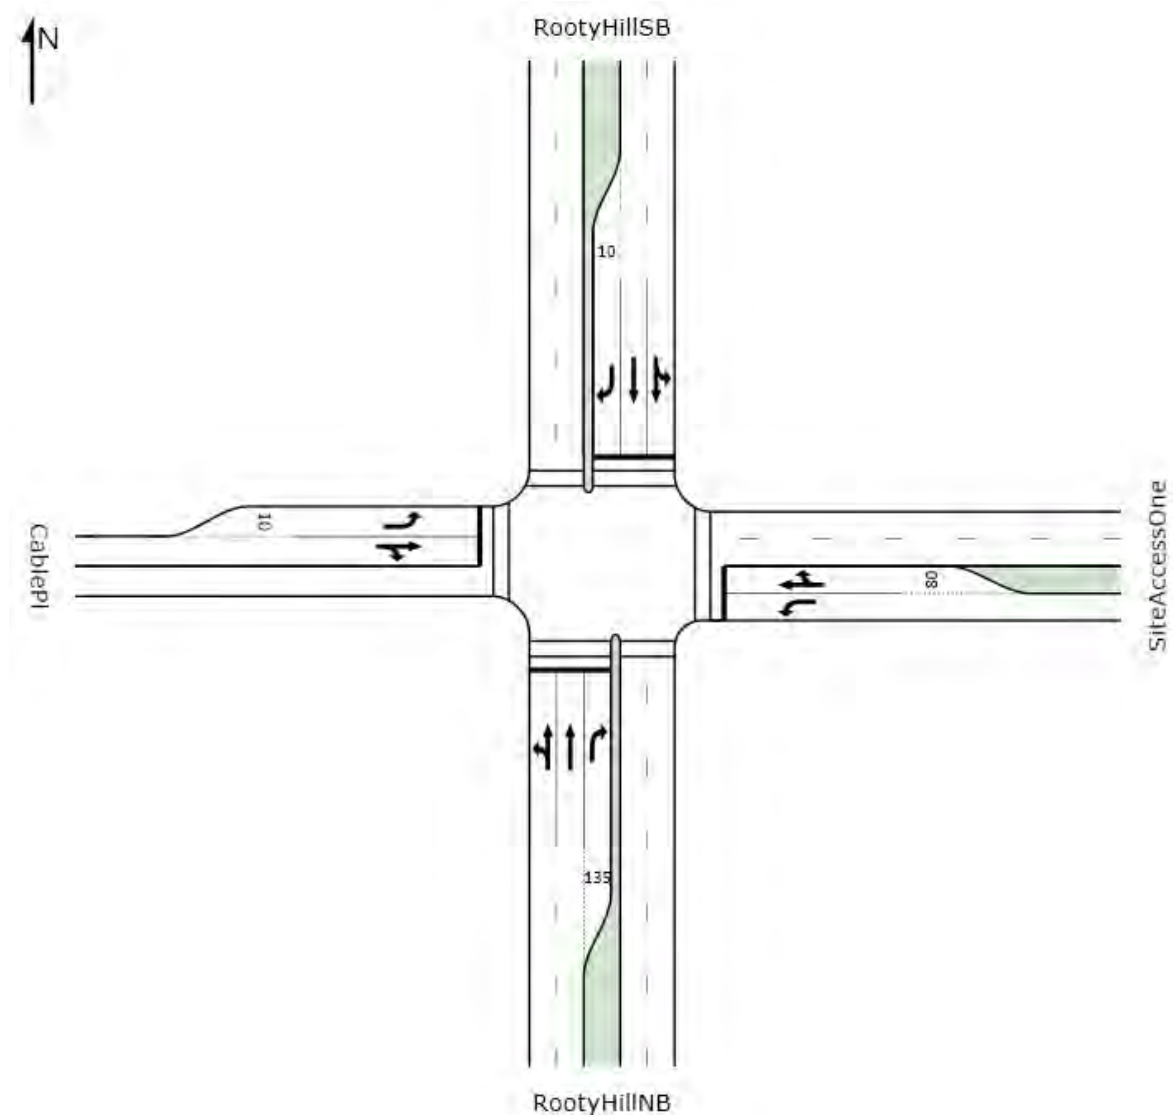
Proposed Intersection of Rooty Hill Road South with Primary Site Access
